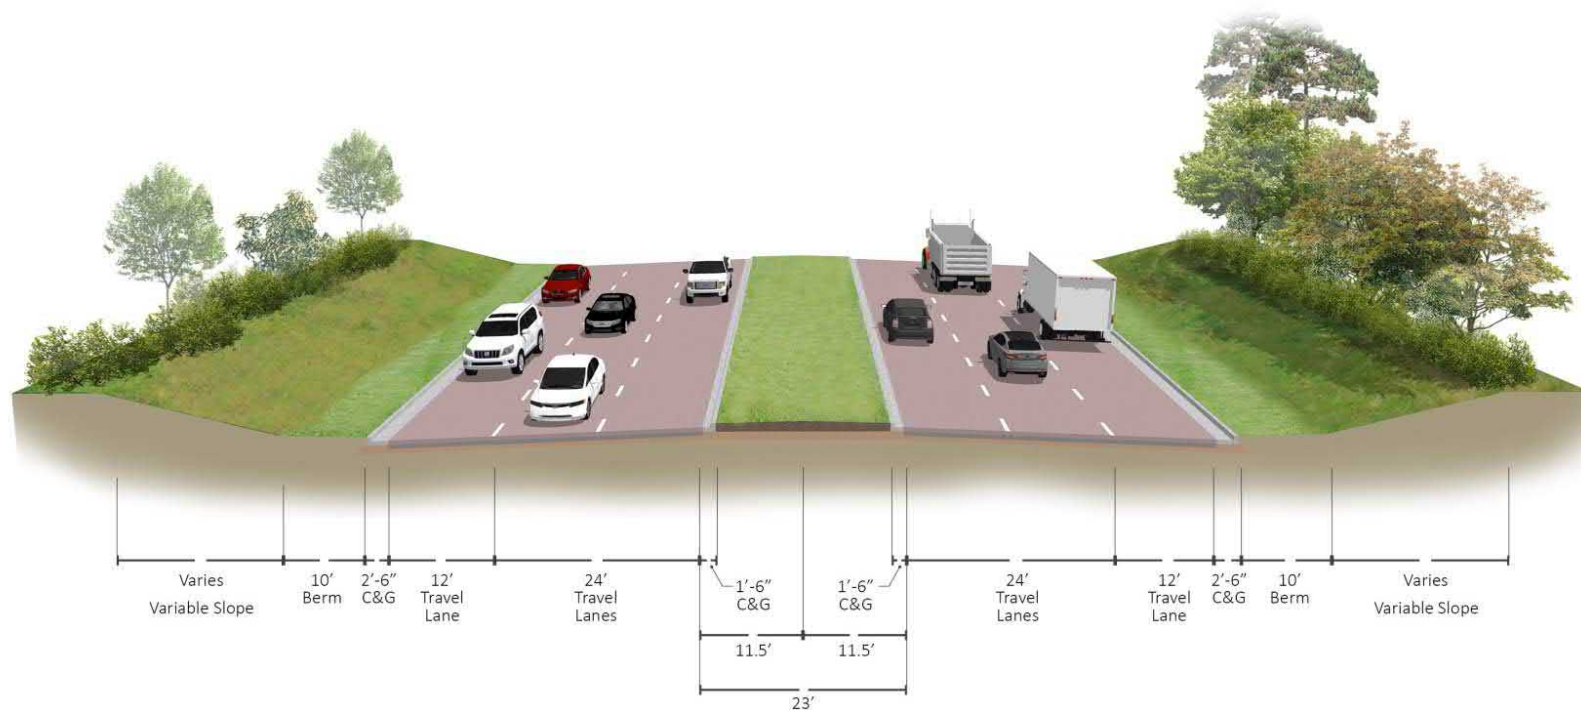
Current Detailed Study Alternatives Typical Section – six-lane arterial widening (US 421)
